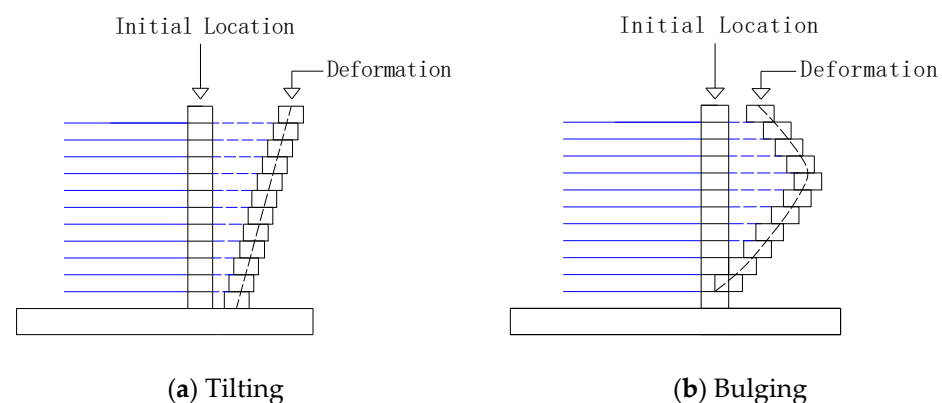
Horizontal deformation mode of the reinforced soil retaining wall.
